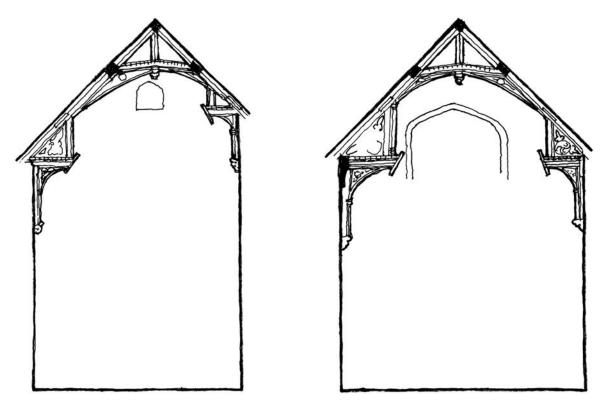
Sketch sections of the hammerbeam roof of the Audley Chapel, St Michael's Church, Berechurch Hall Road (corpus no. 2), showing hammer beams of different lengths (not to scale)
